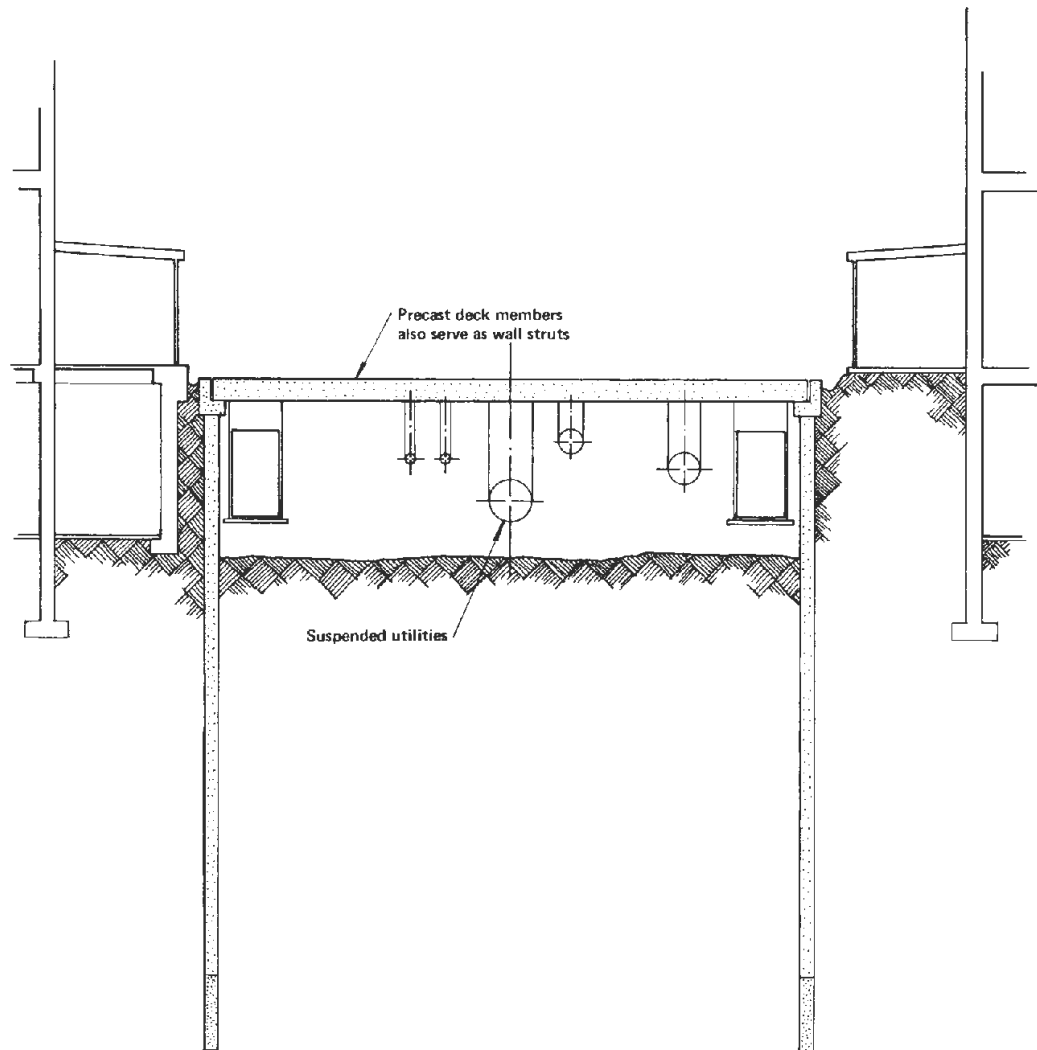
Step 10: Set street level prefabricated units and suspend utilities.
